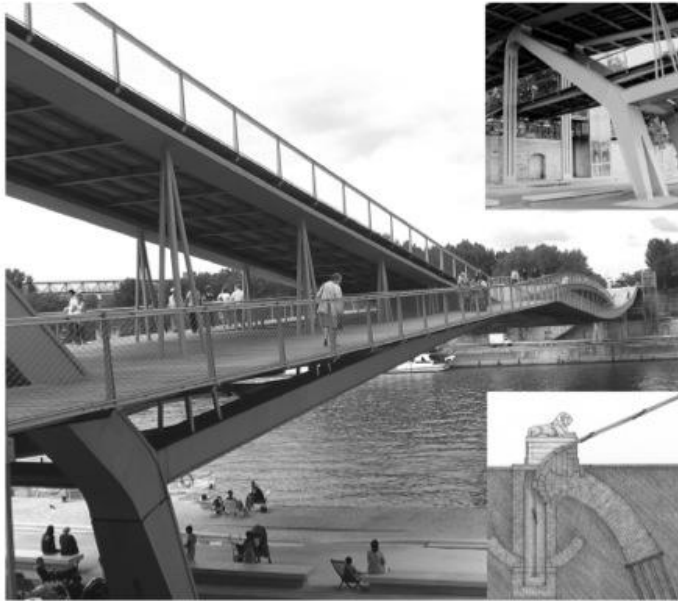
Passerelle Simone de Beauvoir, Paris. Insets: Anchorages of the Passerelle and Pont des Invalides.
